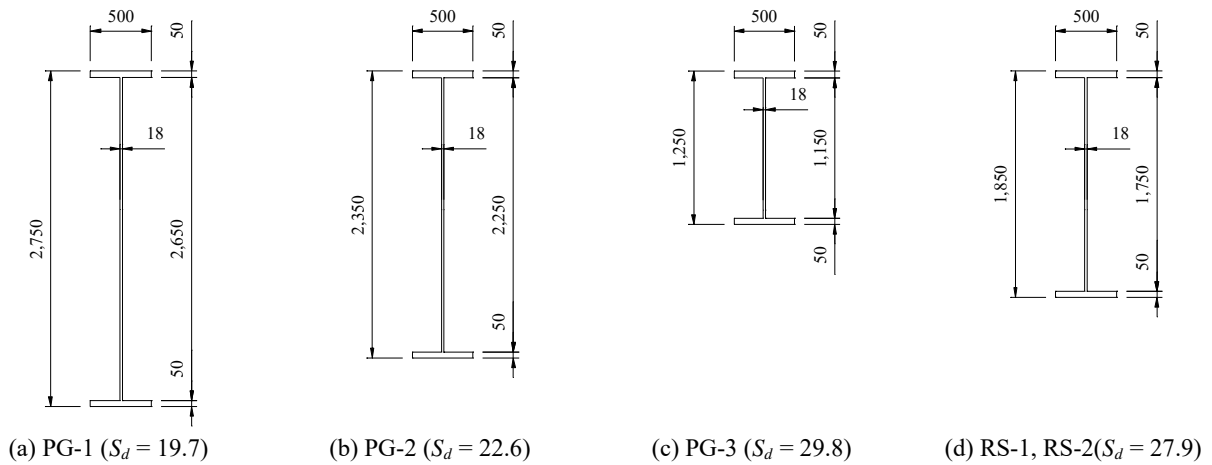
Various cross-sections for two-span continuous beams (Unit: mm)
